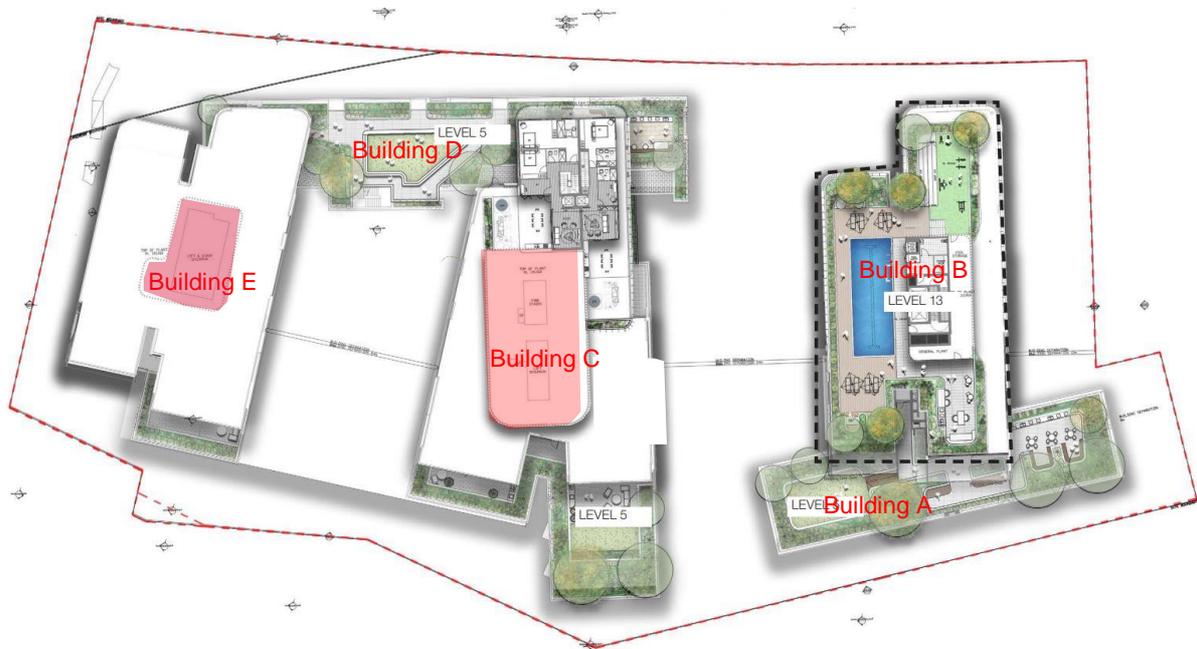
| Rooftop communal open spaces with plant rooms and roof of Building C and Building E shaded red (Source: Applicant's RTS)
